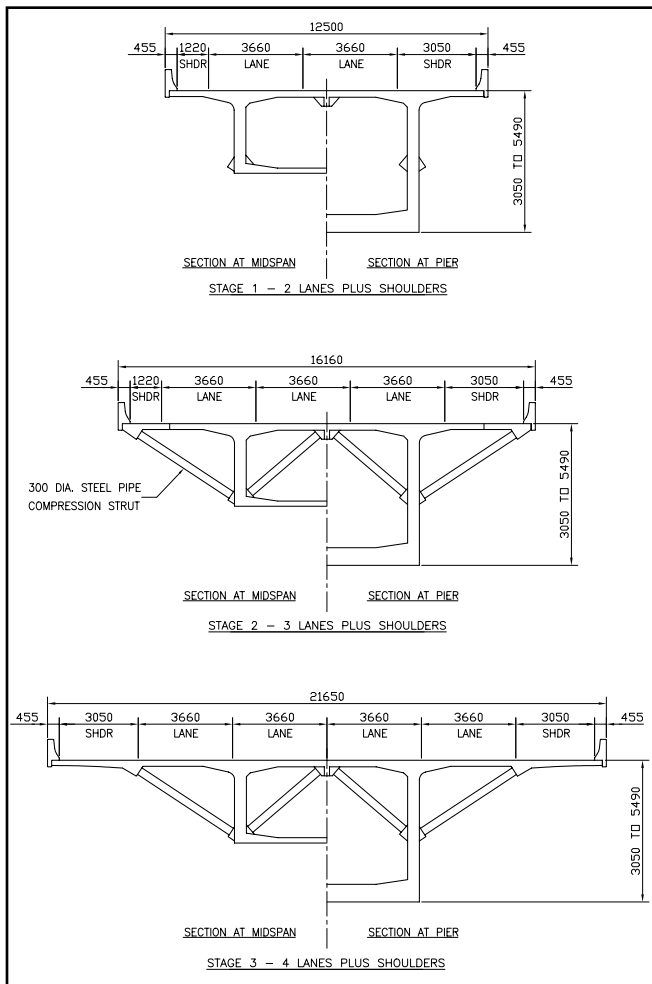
Proposed cross section widening at midspan and pier for North Halawa Valley Viaduct.
